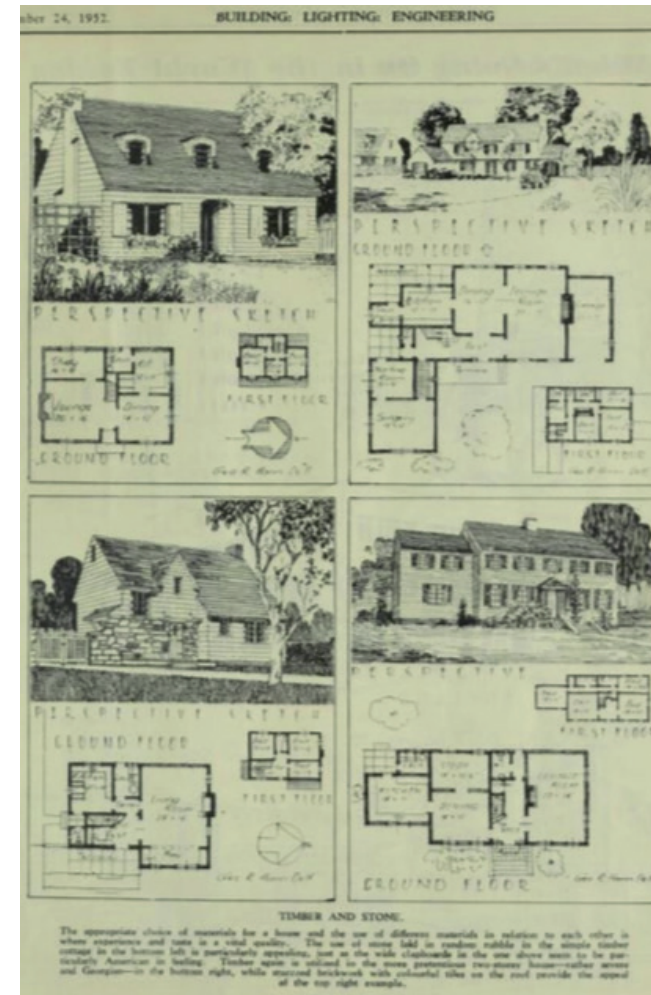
Typical Australian project from the 1920s. Building, Lighting, Engineering.
